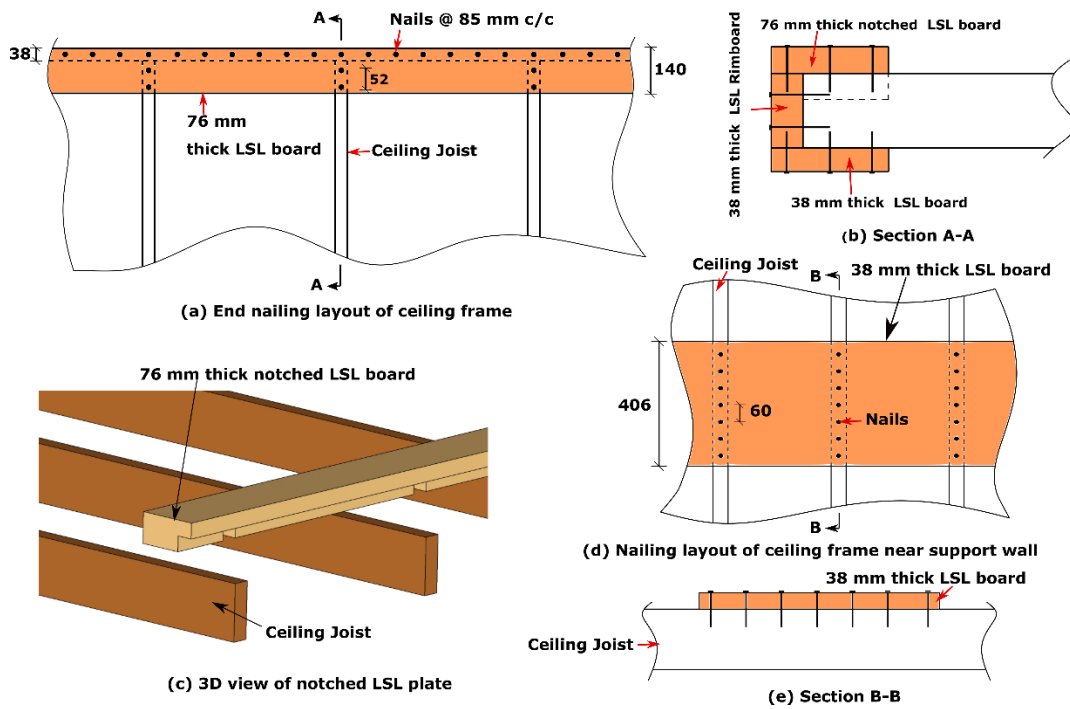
Ceiling frame nailing details (all dimensions are in mm).
